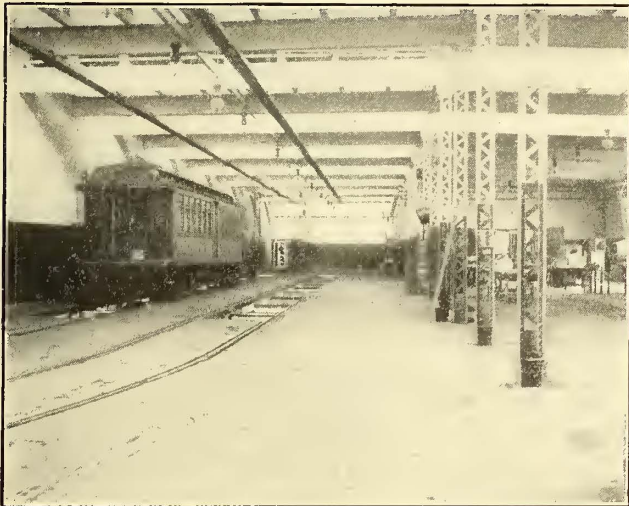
THE TWO TRACKS ON THE SECOND FLOOR OF MAIN SHOP BUILDING; THE INNER TRACK LEADS TO THE ELEVATOR
